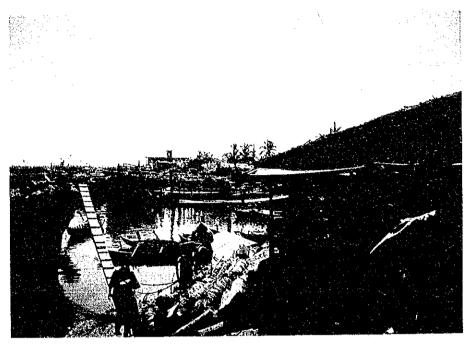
"Ben Dinh" Principal Fishing Port within Vung Tau City There is no landing dock and fish handling area. They are using wooden plank bridge.
